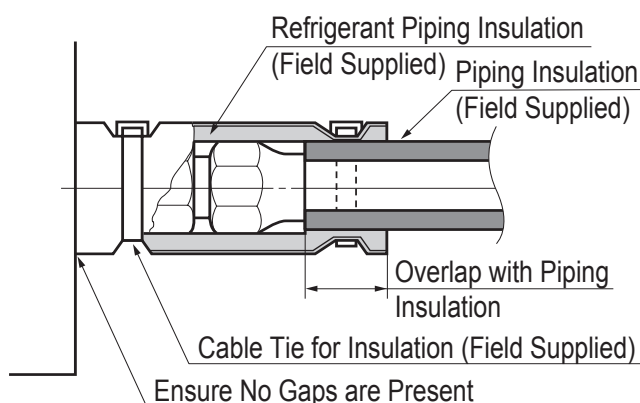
Typical Refrigerant Line Flare Fitting Insulation Detail.
